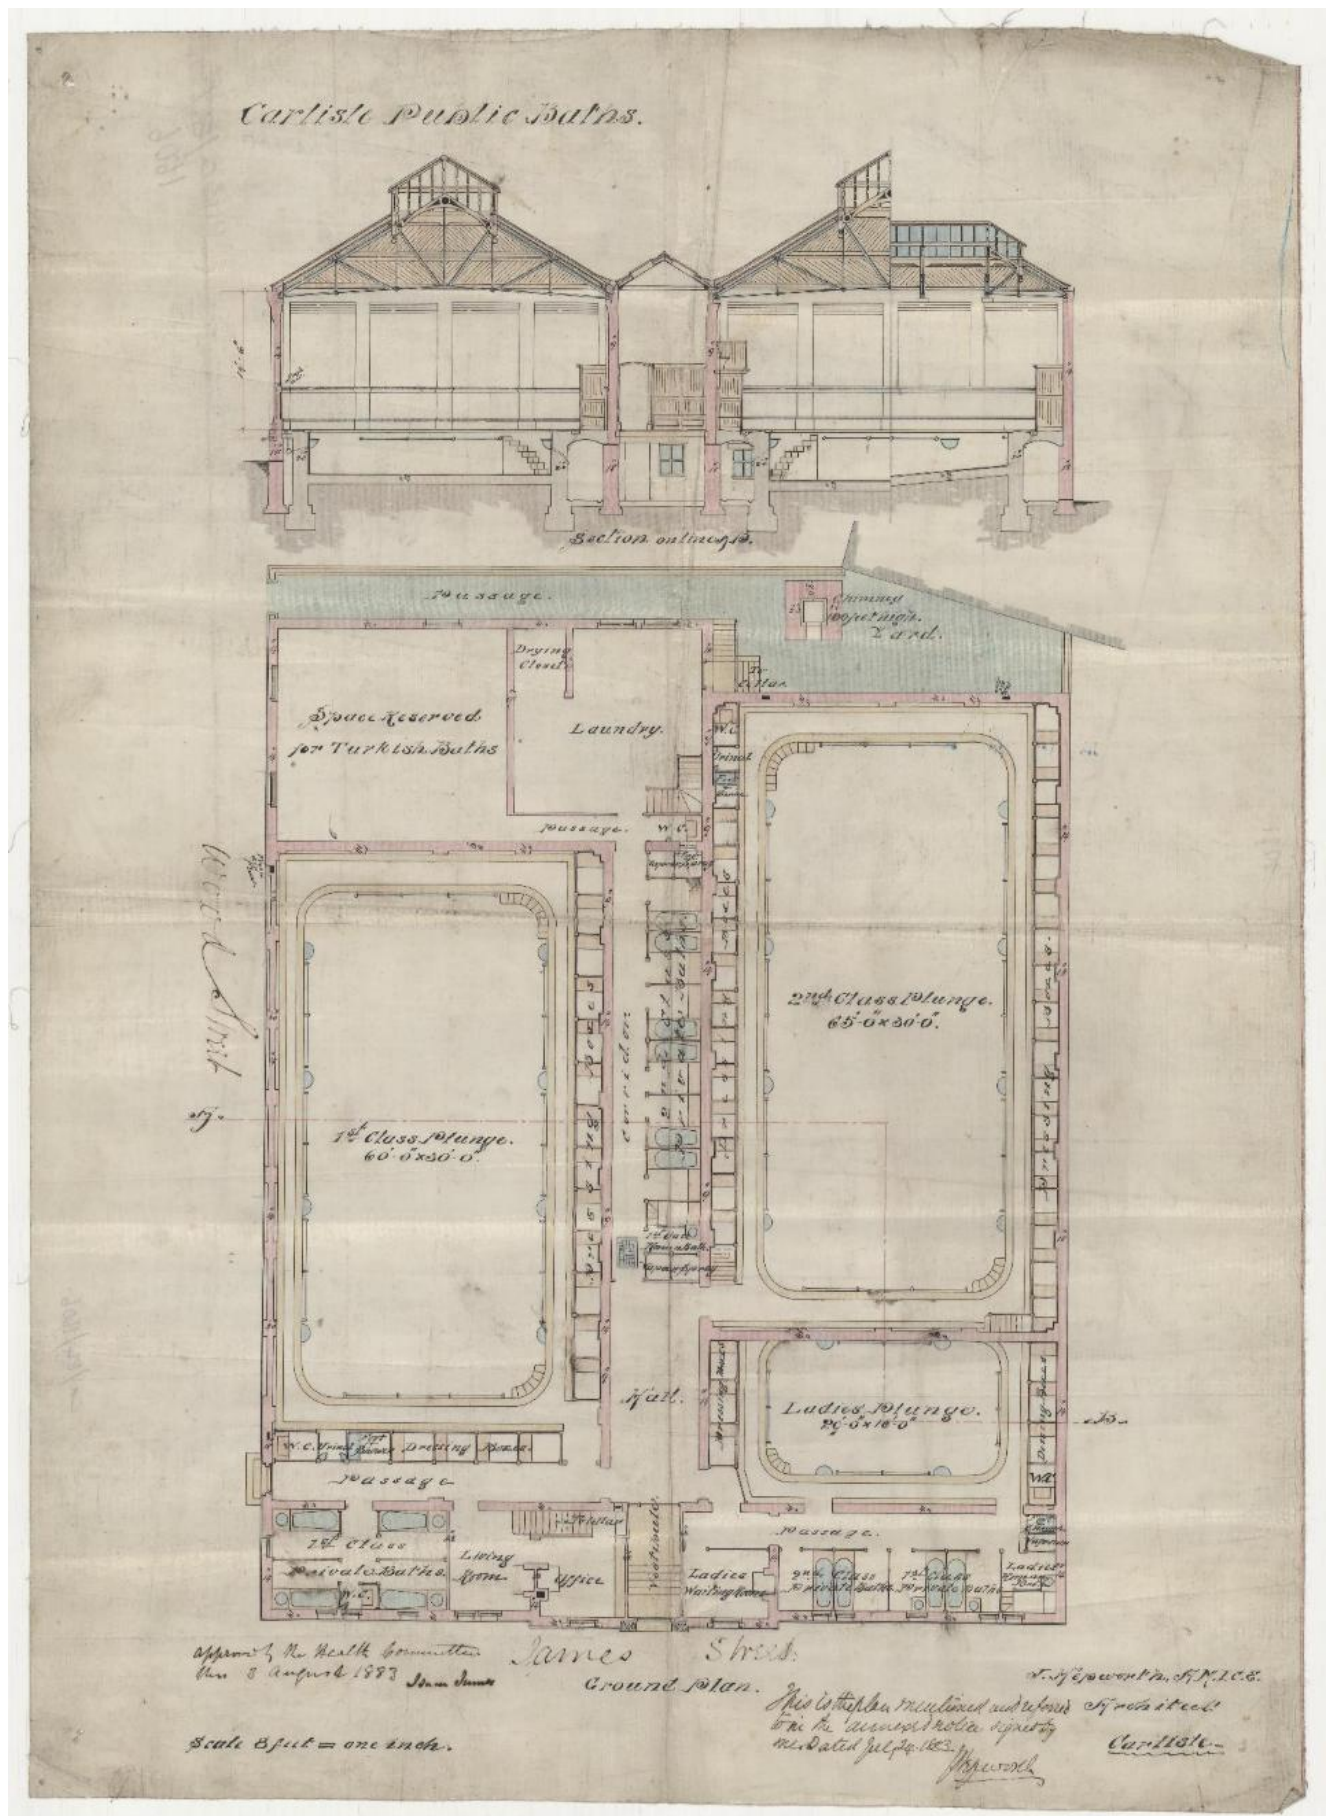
Above: Public Baths Ground Plan 1883 (Cumbria Archives)
